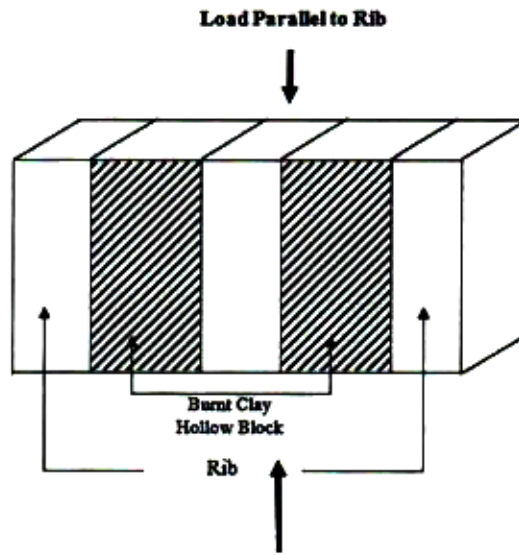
Loading arrangement of a Hollow Block Slab Parallel to the Rib
